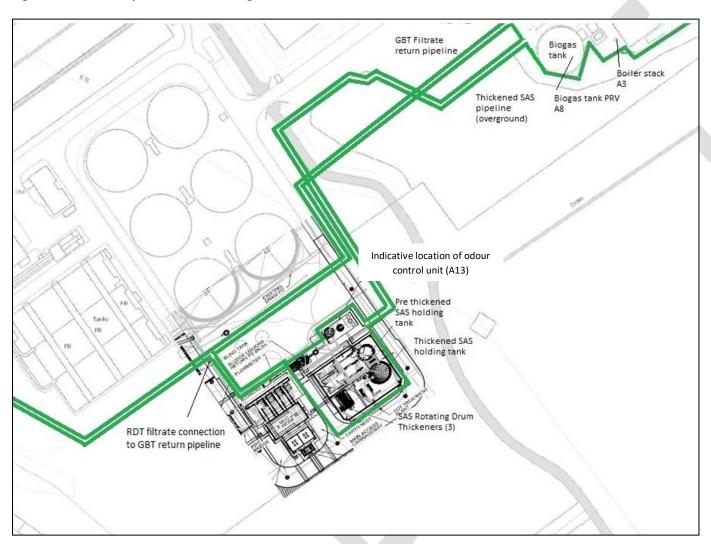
B Site Layout Plan showing the new SAS Treatment Plant
